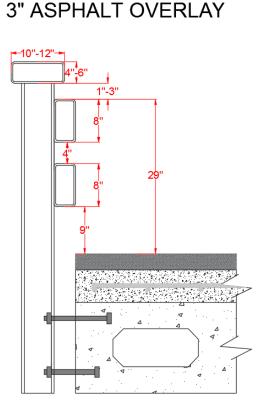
Prototype Bridge Rail Geometry with 6-in. (152-mm) Deep Lower Rails
